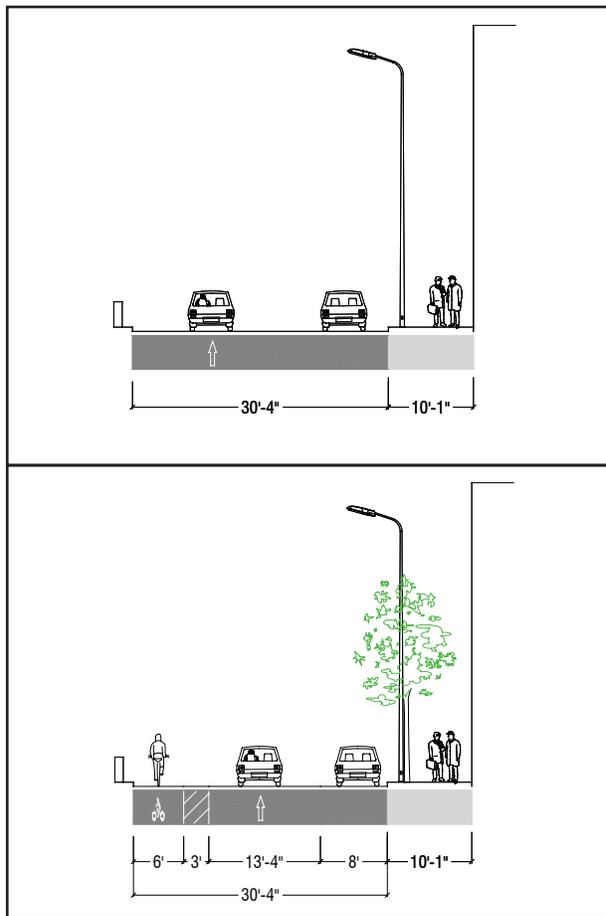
Section 3: East 135<sup>th</sup> Street northerly street segment, existing and recommended cross section (facing west)
